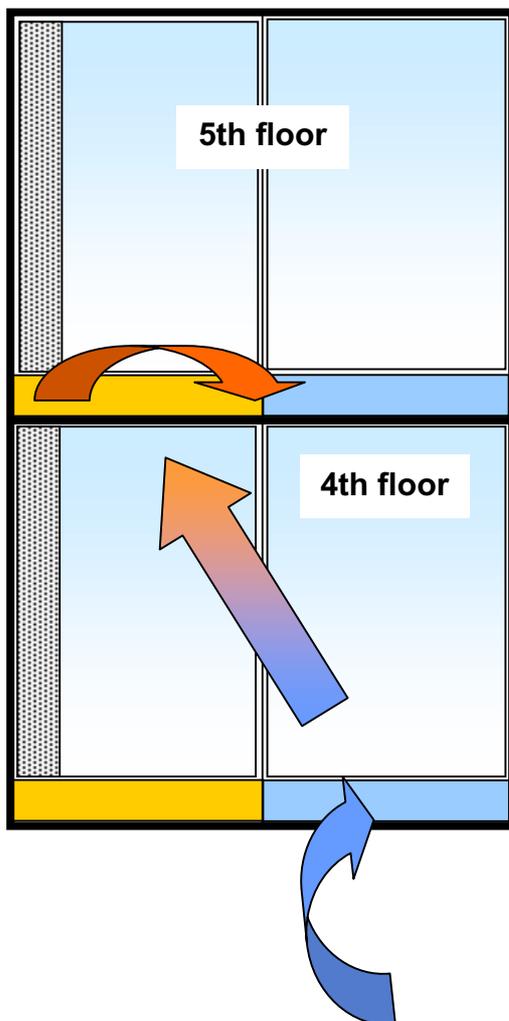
Elevation view of double façade with layout of glass areas and ventilation openings
